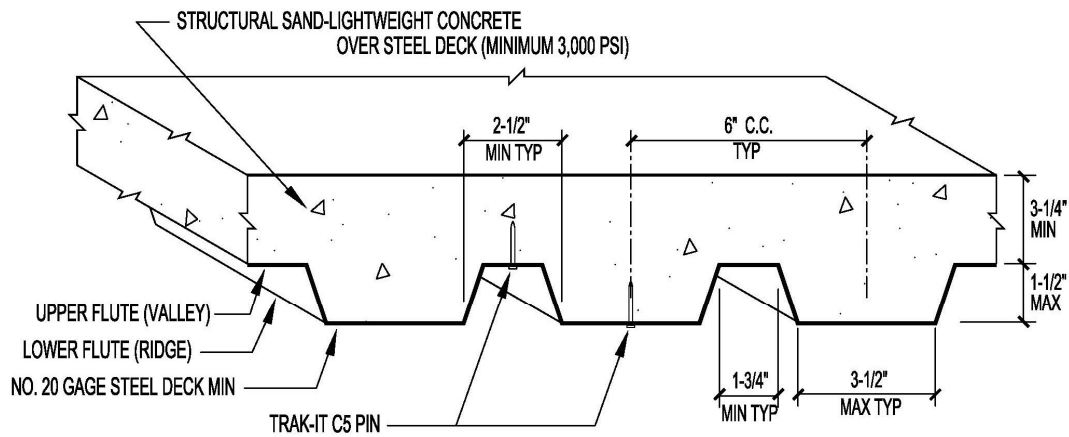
FASTENER INSTALLATION LOCATION IN 1 1/2-INCH-DEEP COMPOSITE DECK
